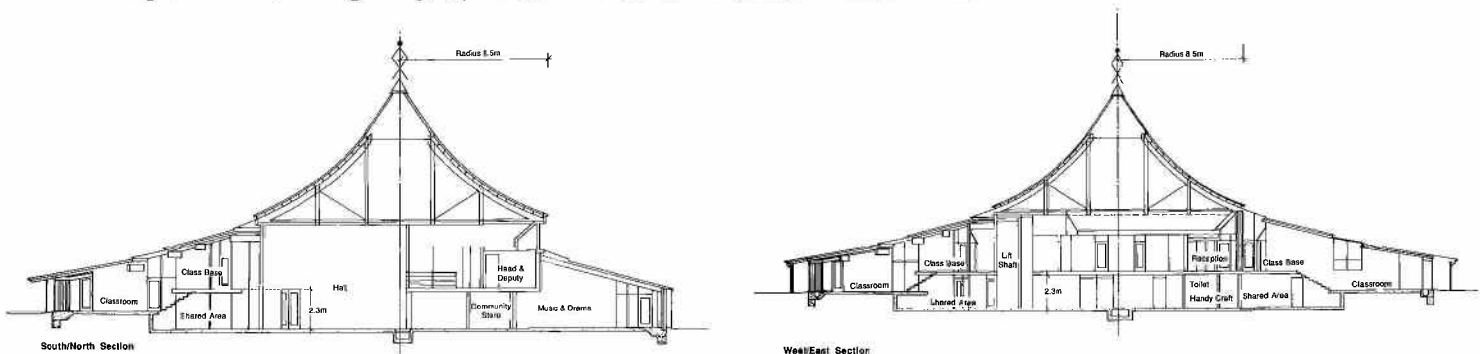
a) b) N/S and E/W sections through conical structure of school
